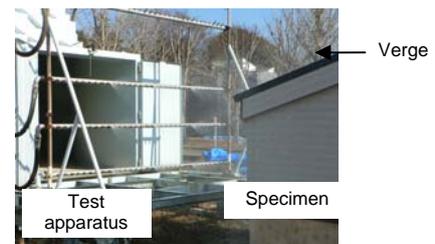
State of Specimens and Testing of Strong Rainfall Testing
